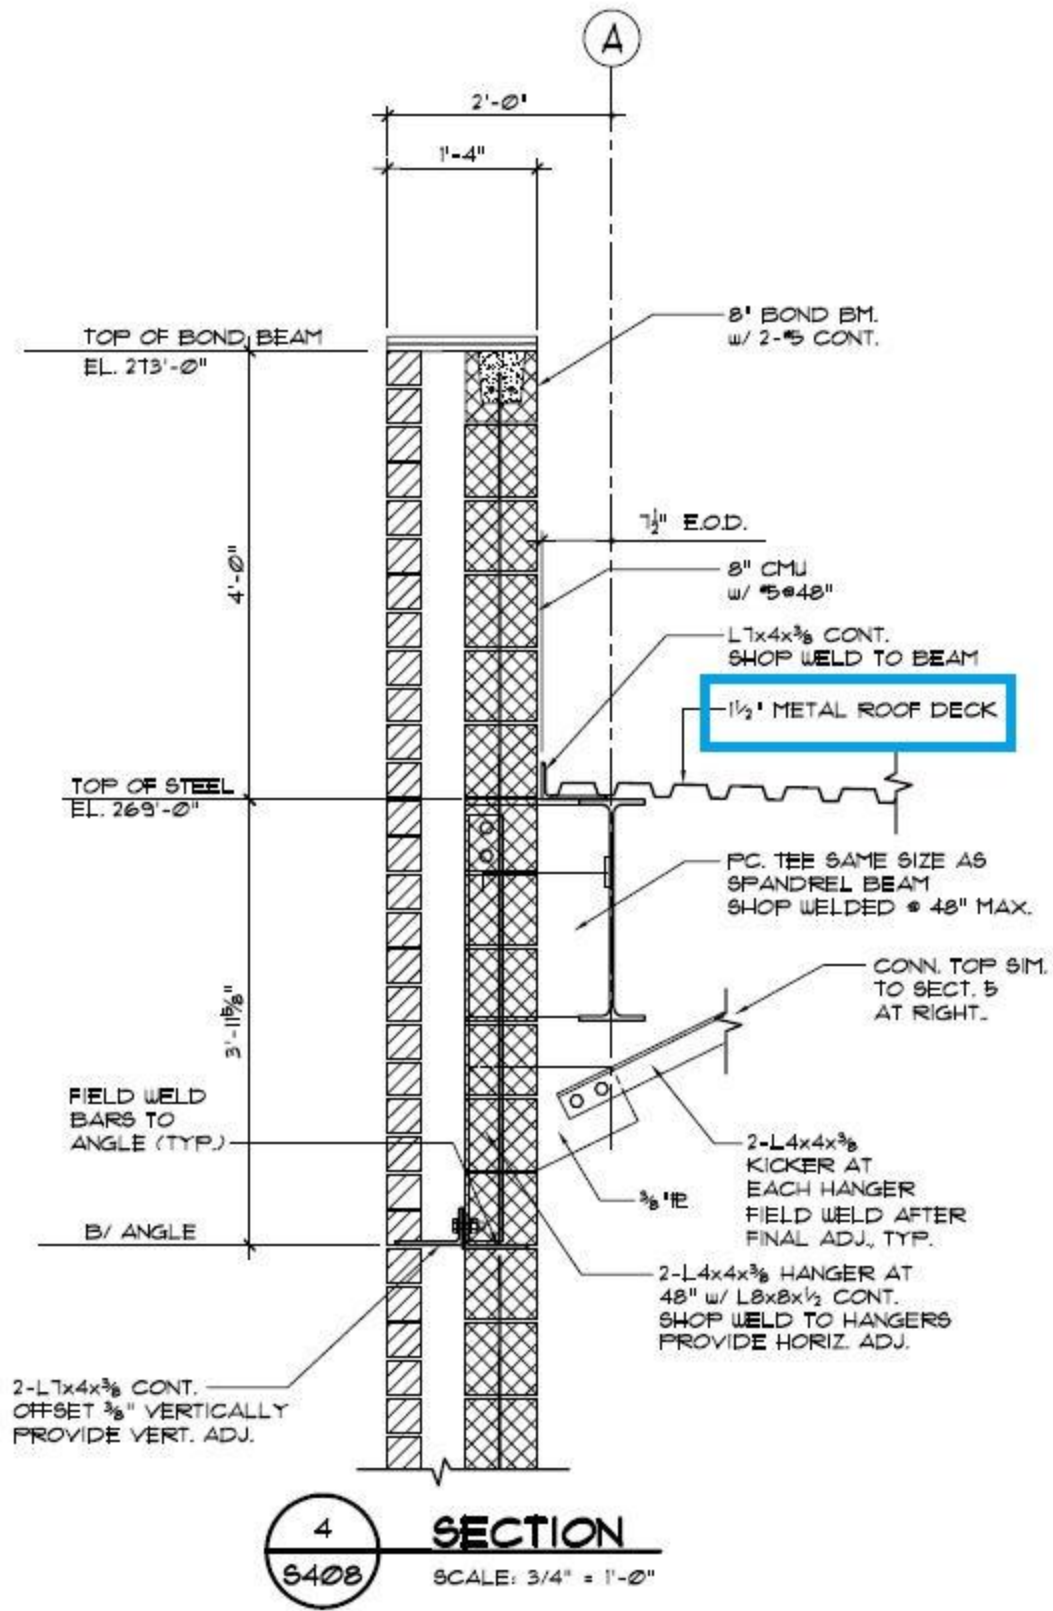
Typical roof section cut showing the roof deck. Courtesy of Highland Associates
